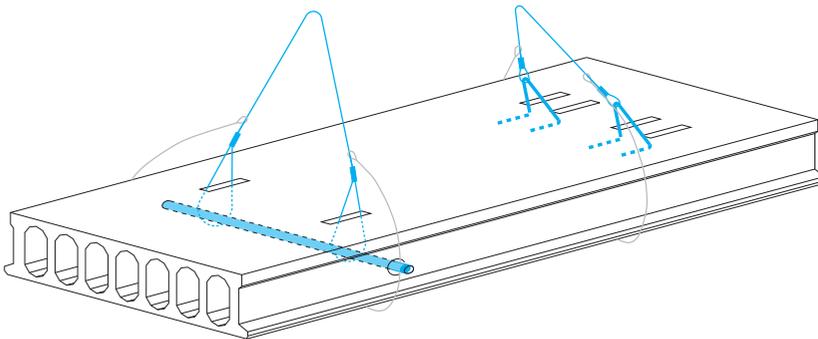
Holes for lifting with cables and blocking rod, or with tested and certified steel forks. Note the safety cables to be detached just before placing the slabs in position
